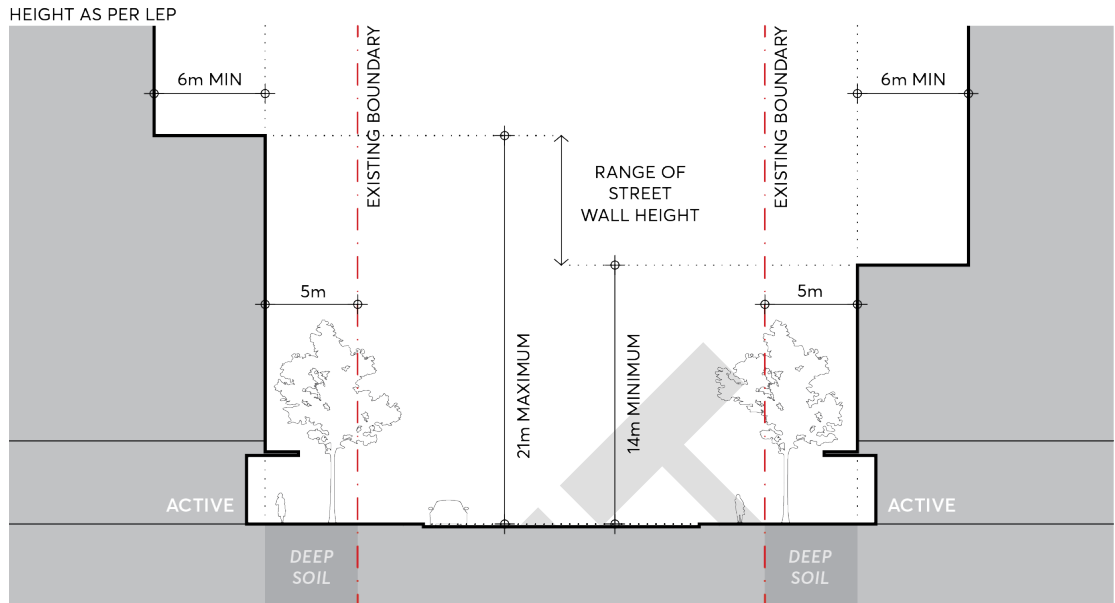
Church Street (Section A) Setbacks and Street Wall Height
